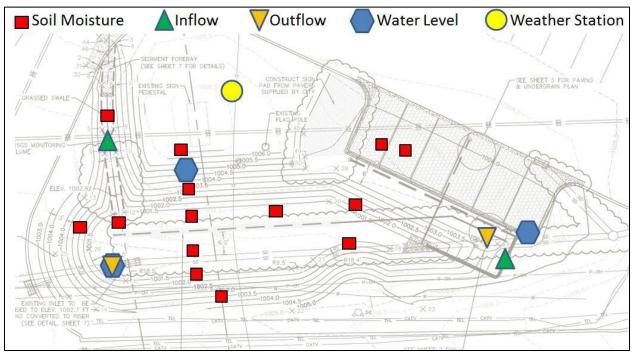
A. Site plan for Sewer Maintenance Facility bioretention system monitoring equipment.
